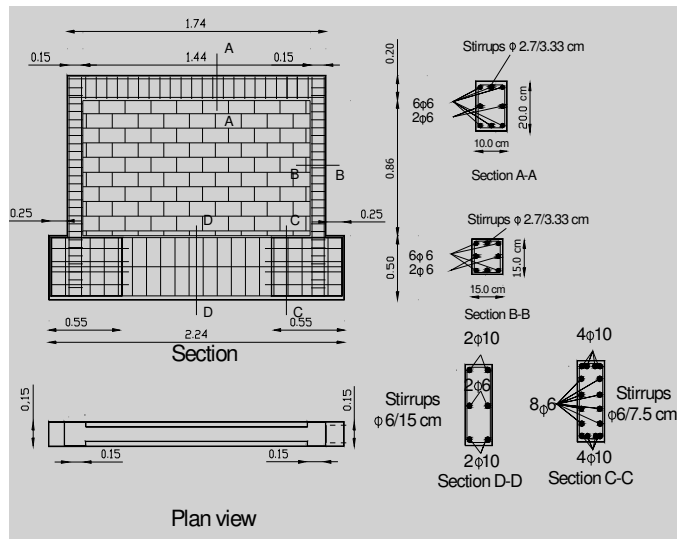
Masonry infilled R/C frame F8NR specimen and design details [8].
